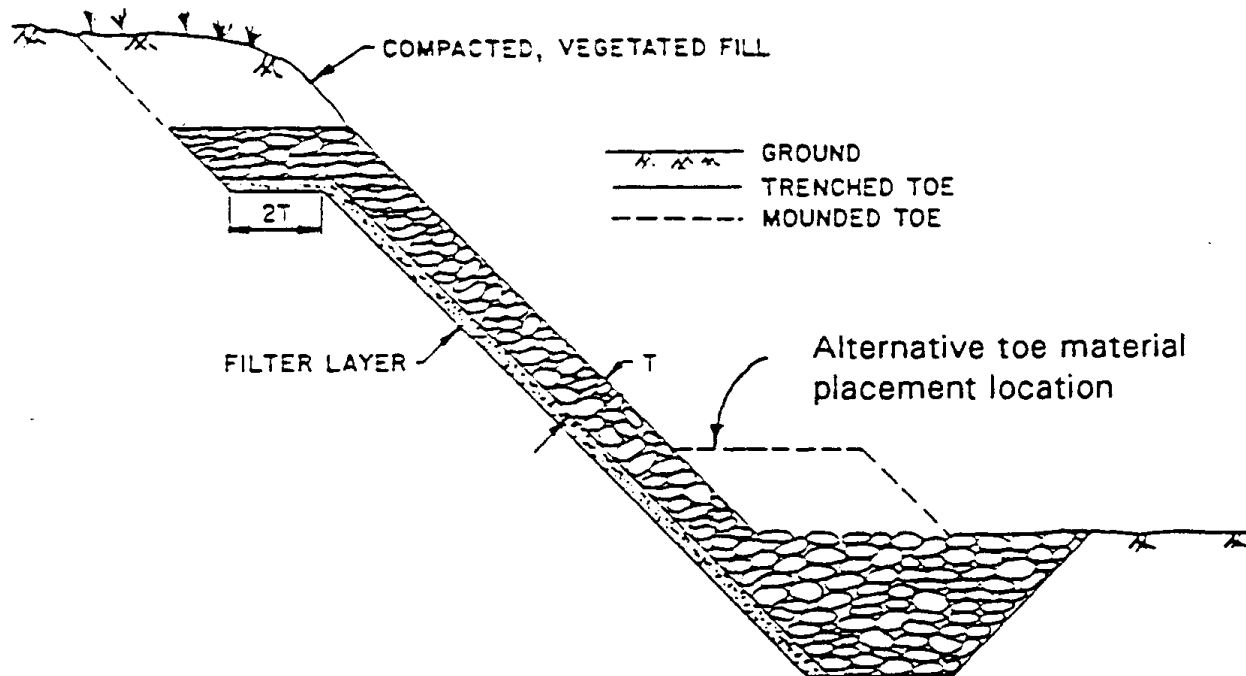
Typical Riprap Installation - Bank Protection Only
